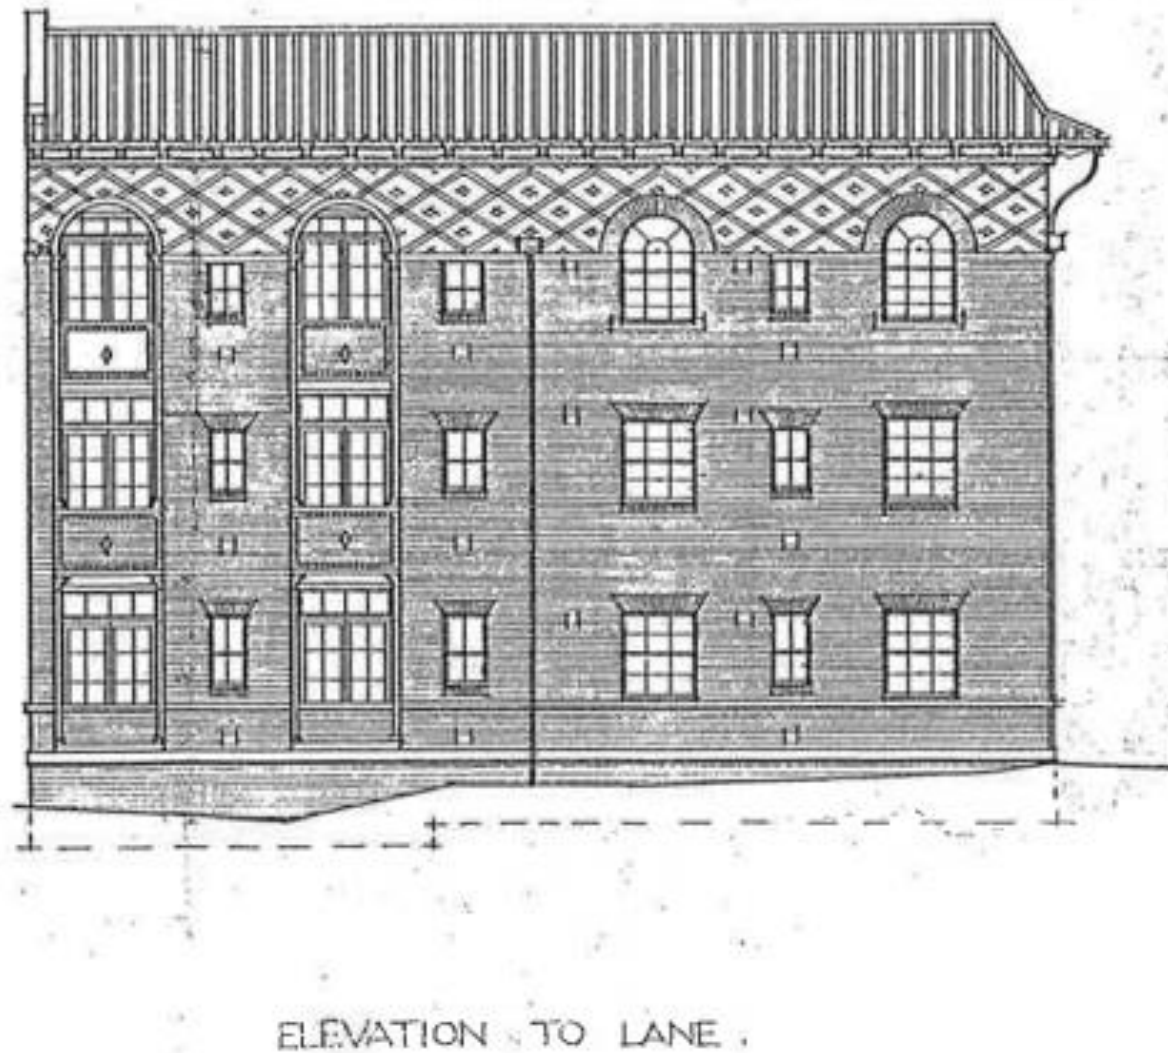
Proposed elevation to lane (now facing the School gym building), 1926.
